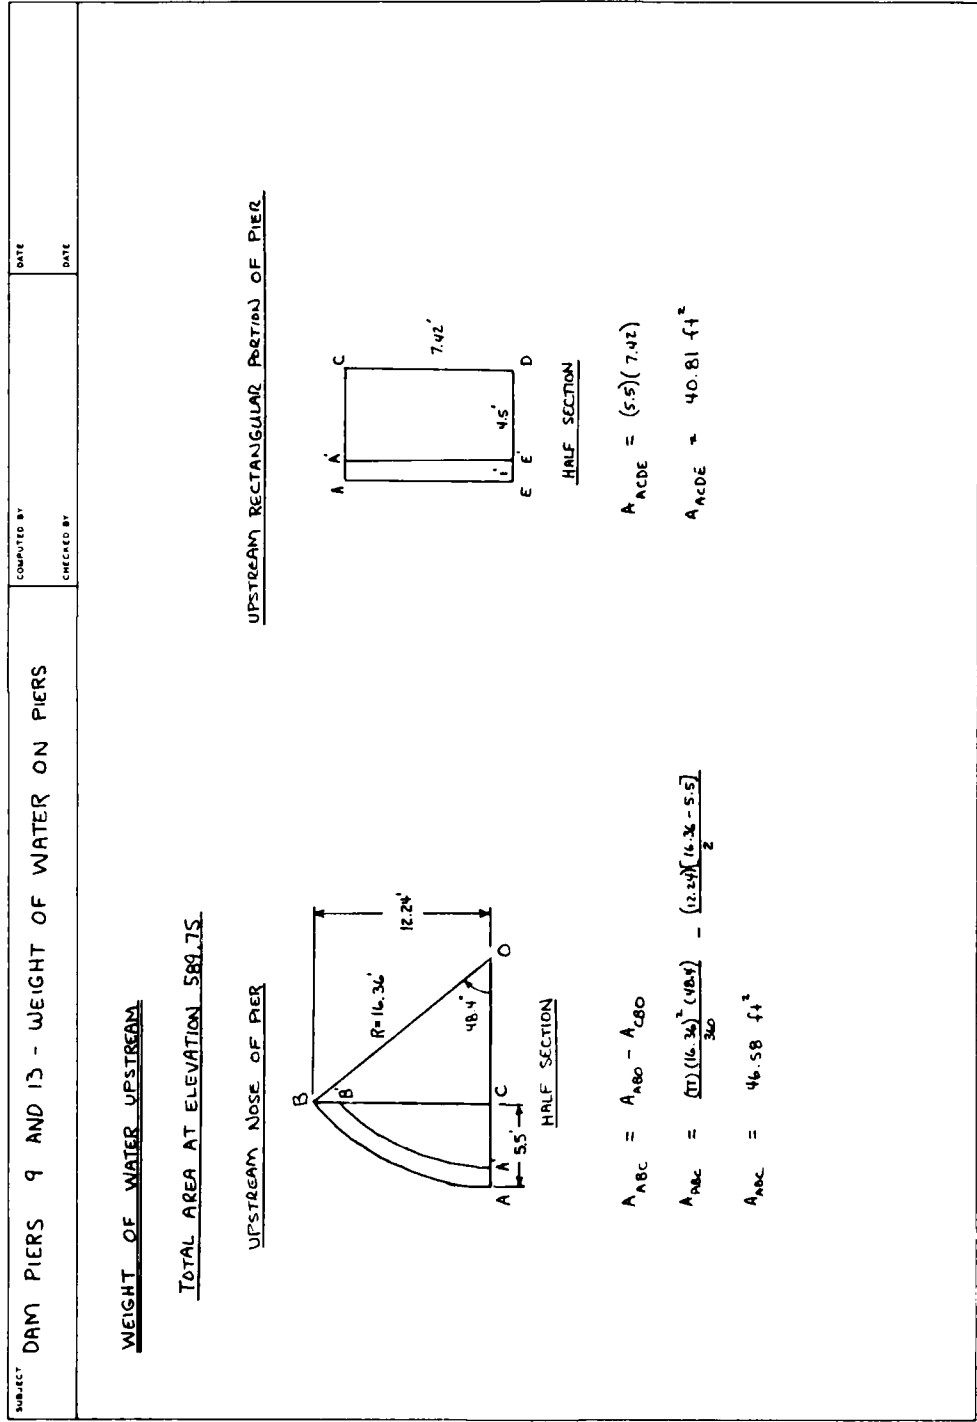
Weight of water on piers, dam piers 9 and 13, Soo Dam (Sheet 1 of 5)
